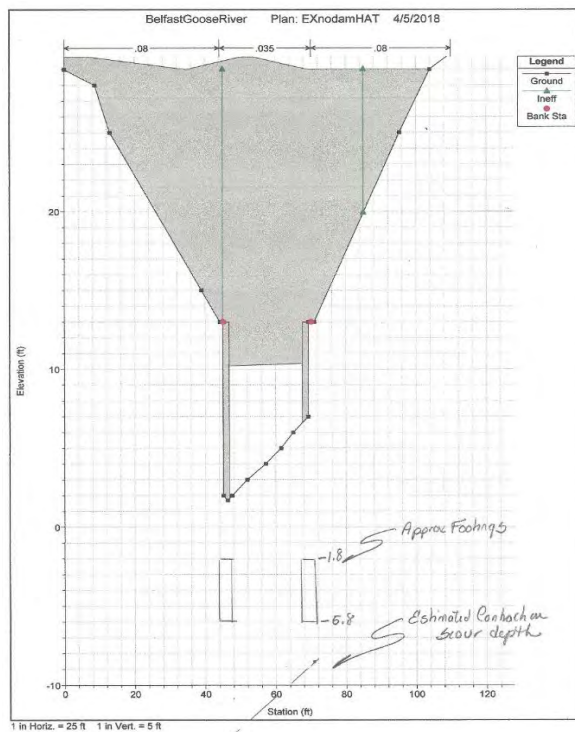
Contraction scour, 100-year, existing bridge assuming no dam.
